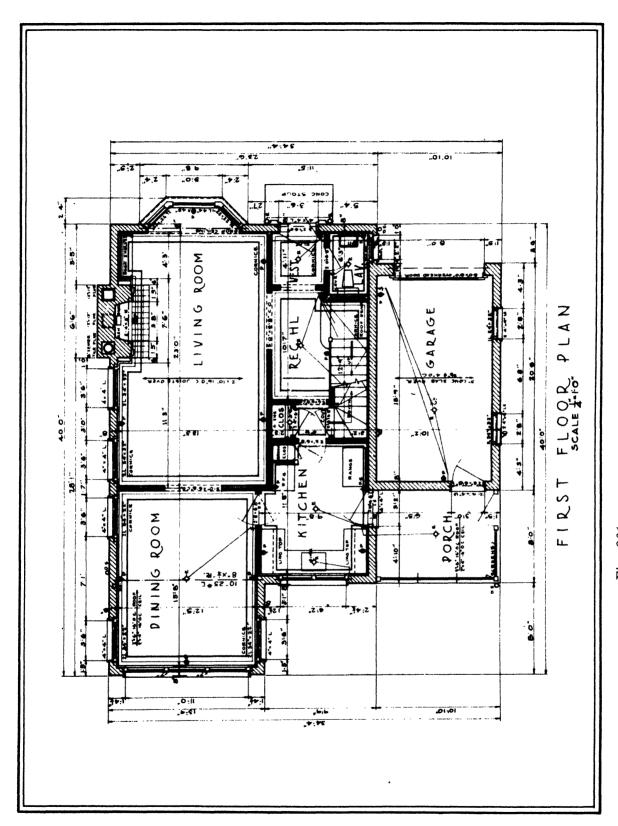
FIRST FLOOR PLAN OF SIX-ROOM HOUSE
